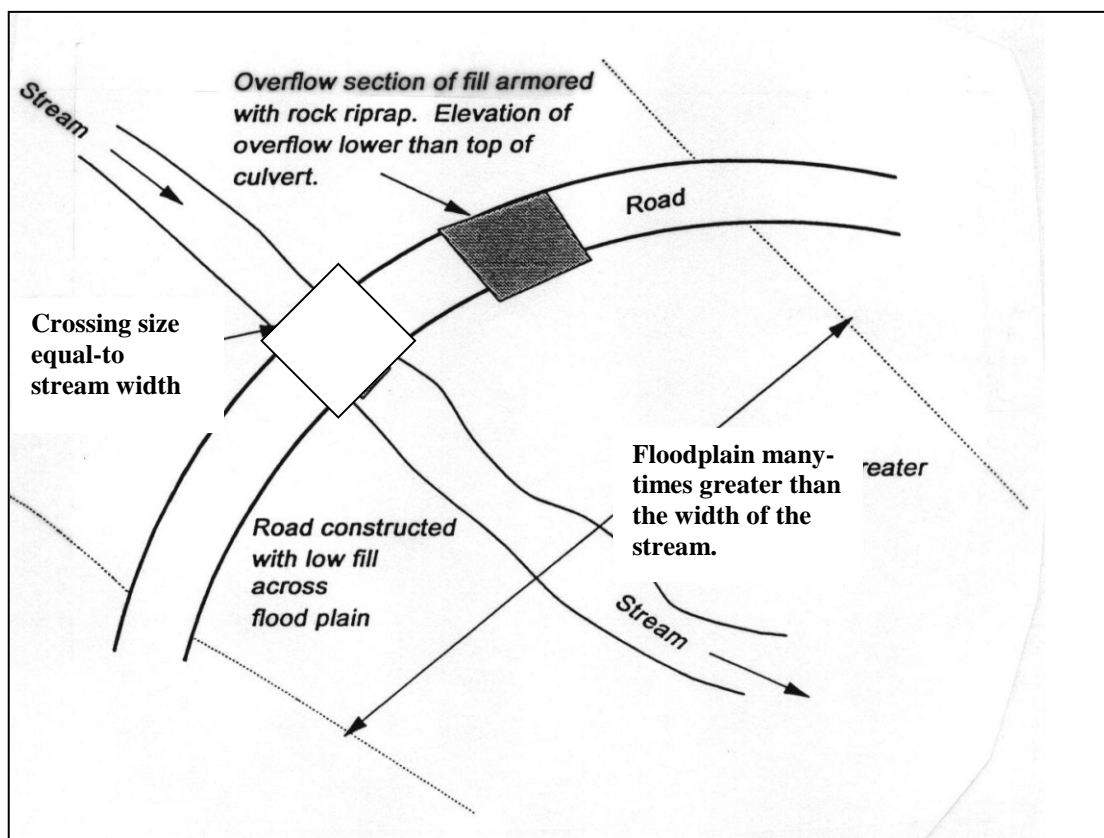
Features for the optional design of constructing a road with low fills and a culvert or bridge with less-than a 50-year peak flow capacity. (Adapted from landowner reference manual)
